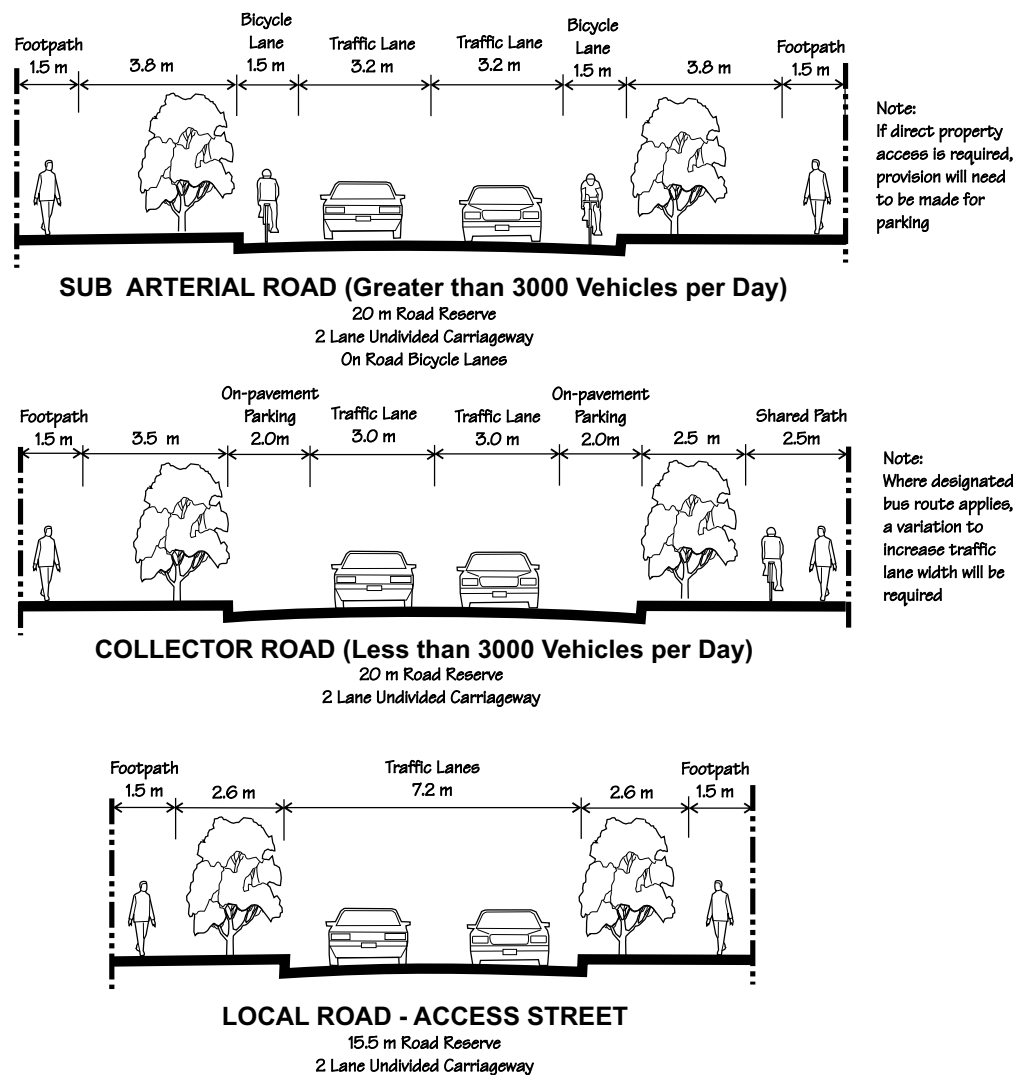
Road Hierarchy Plan and Road Cross Sections
